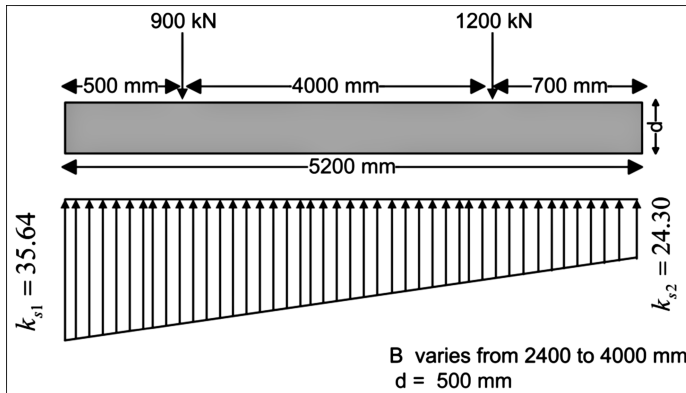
C.14 Details of loading and modulus of the subgrade reaction of a beam resting on an elastic foundation (Example 12.5).
